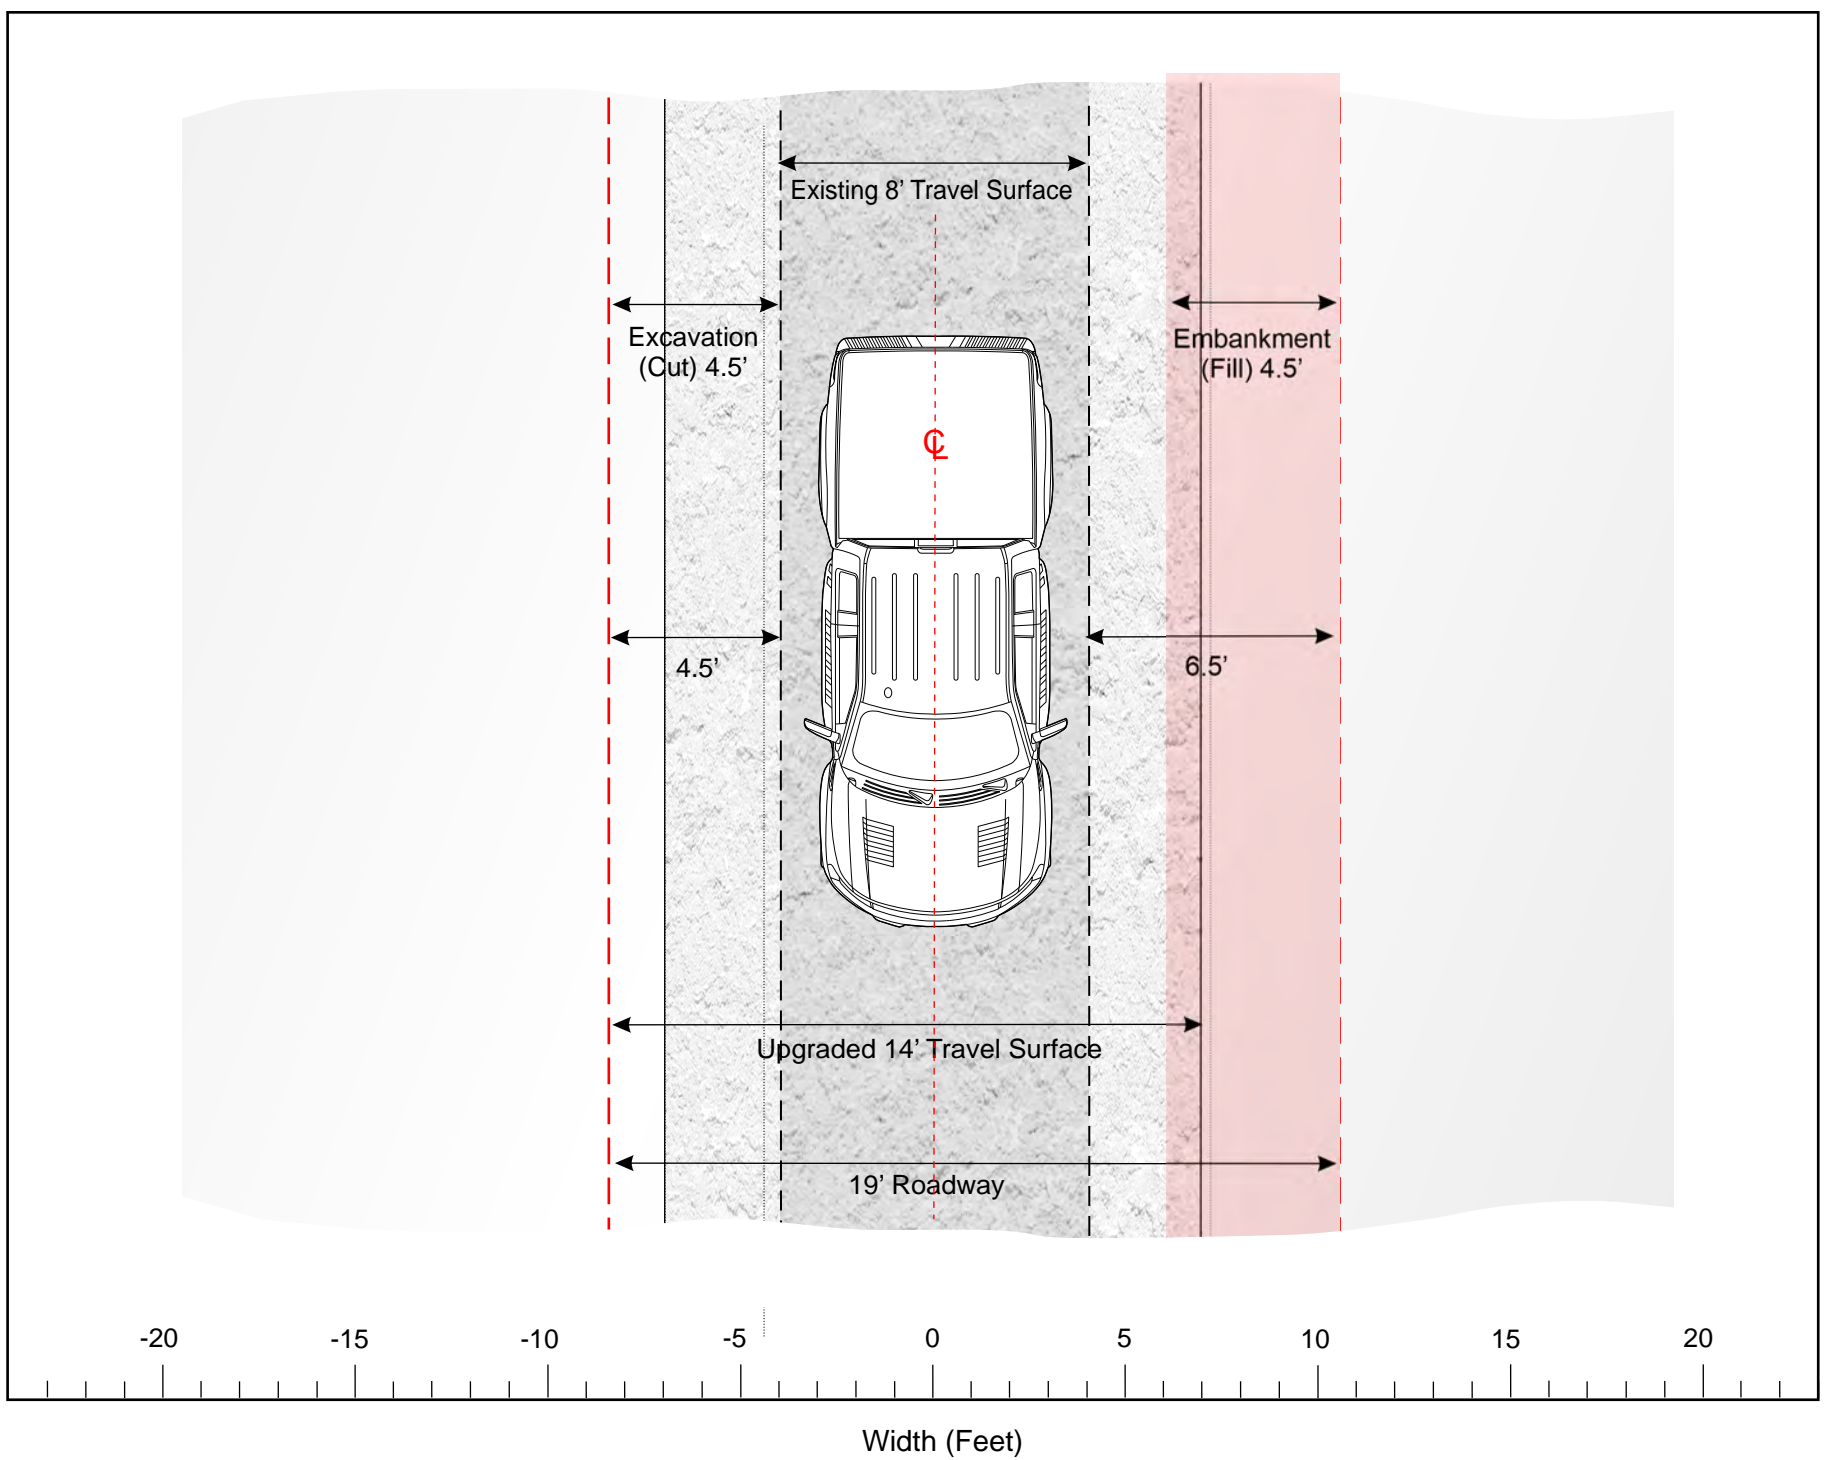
Plan View of Typical Upgraded Narrow-Width Road
